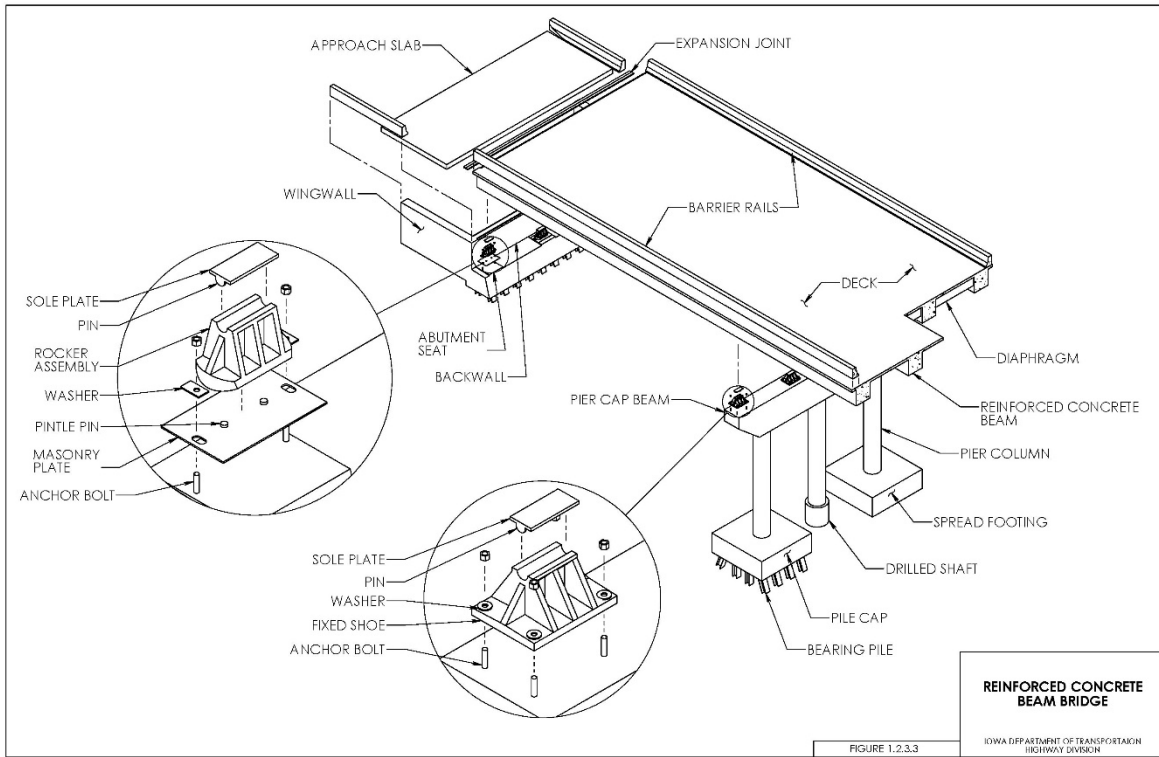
Reinforced Concrete Beam Bridge Components
